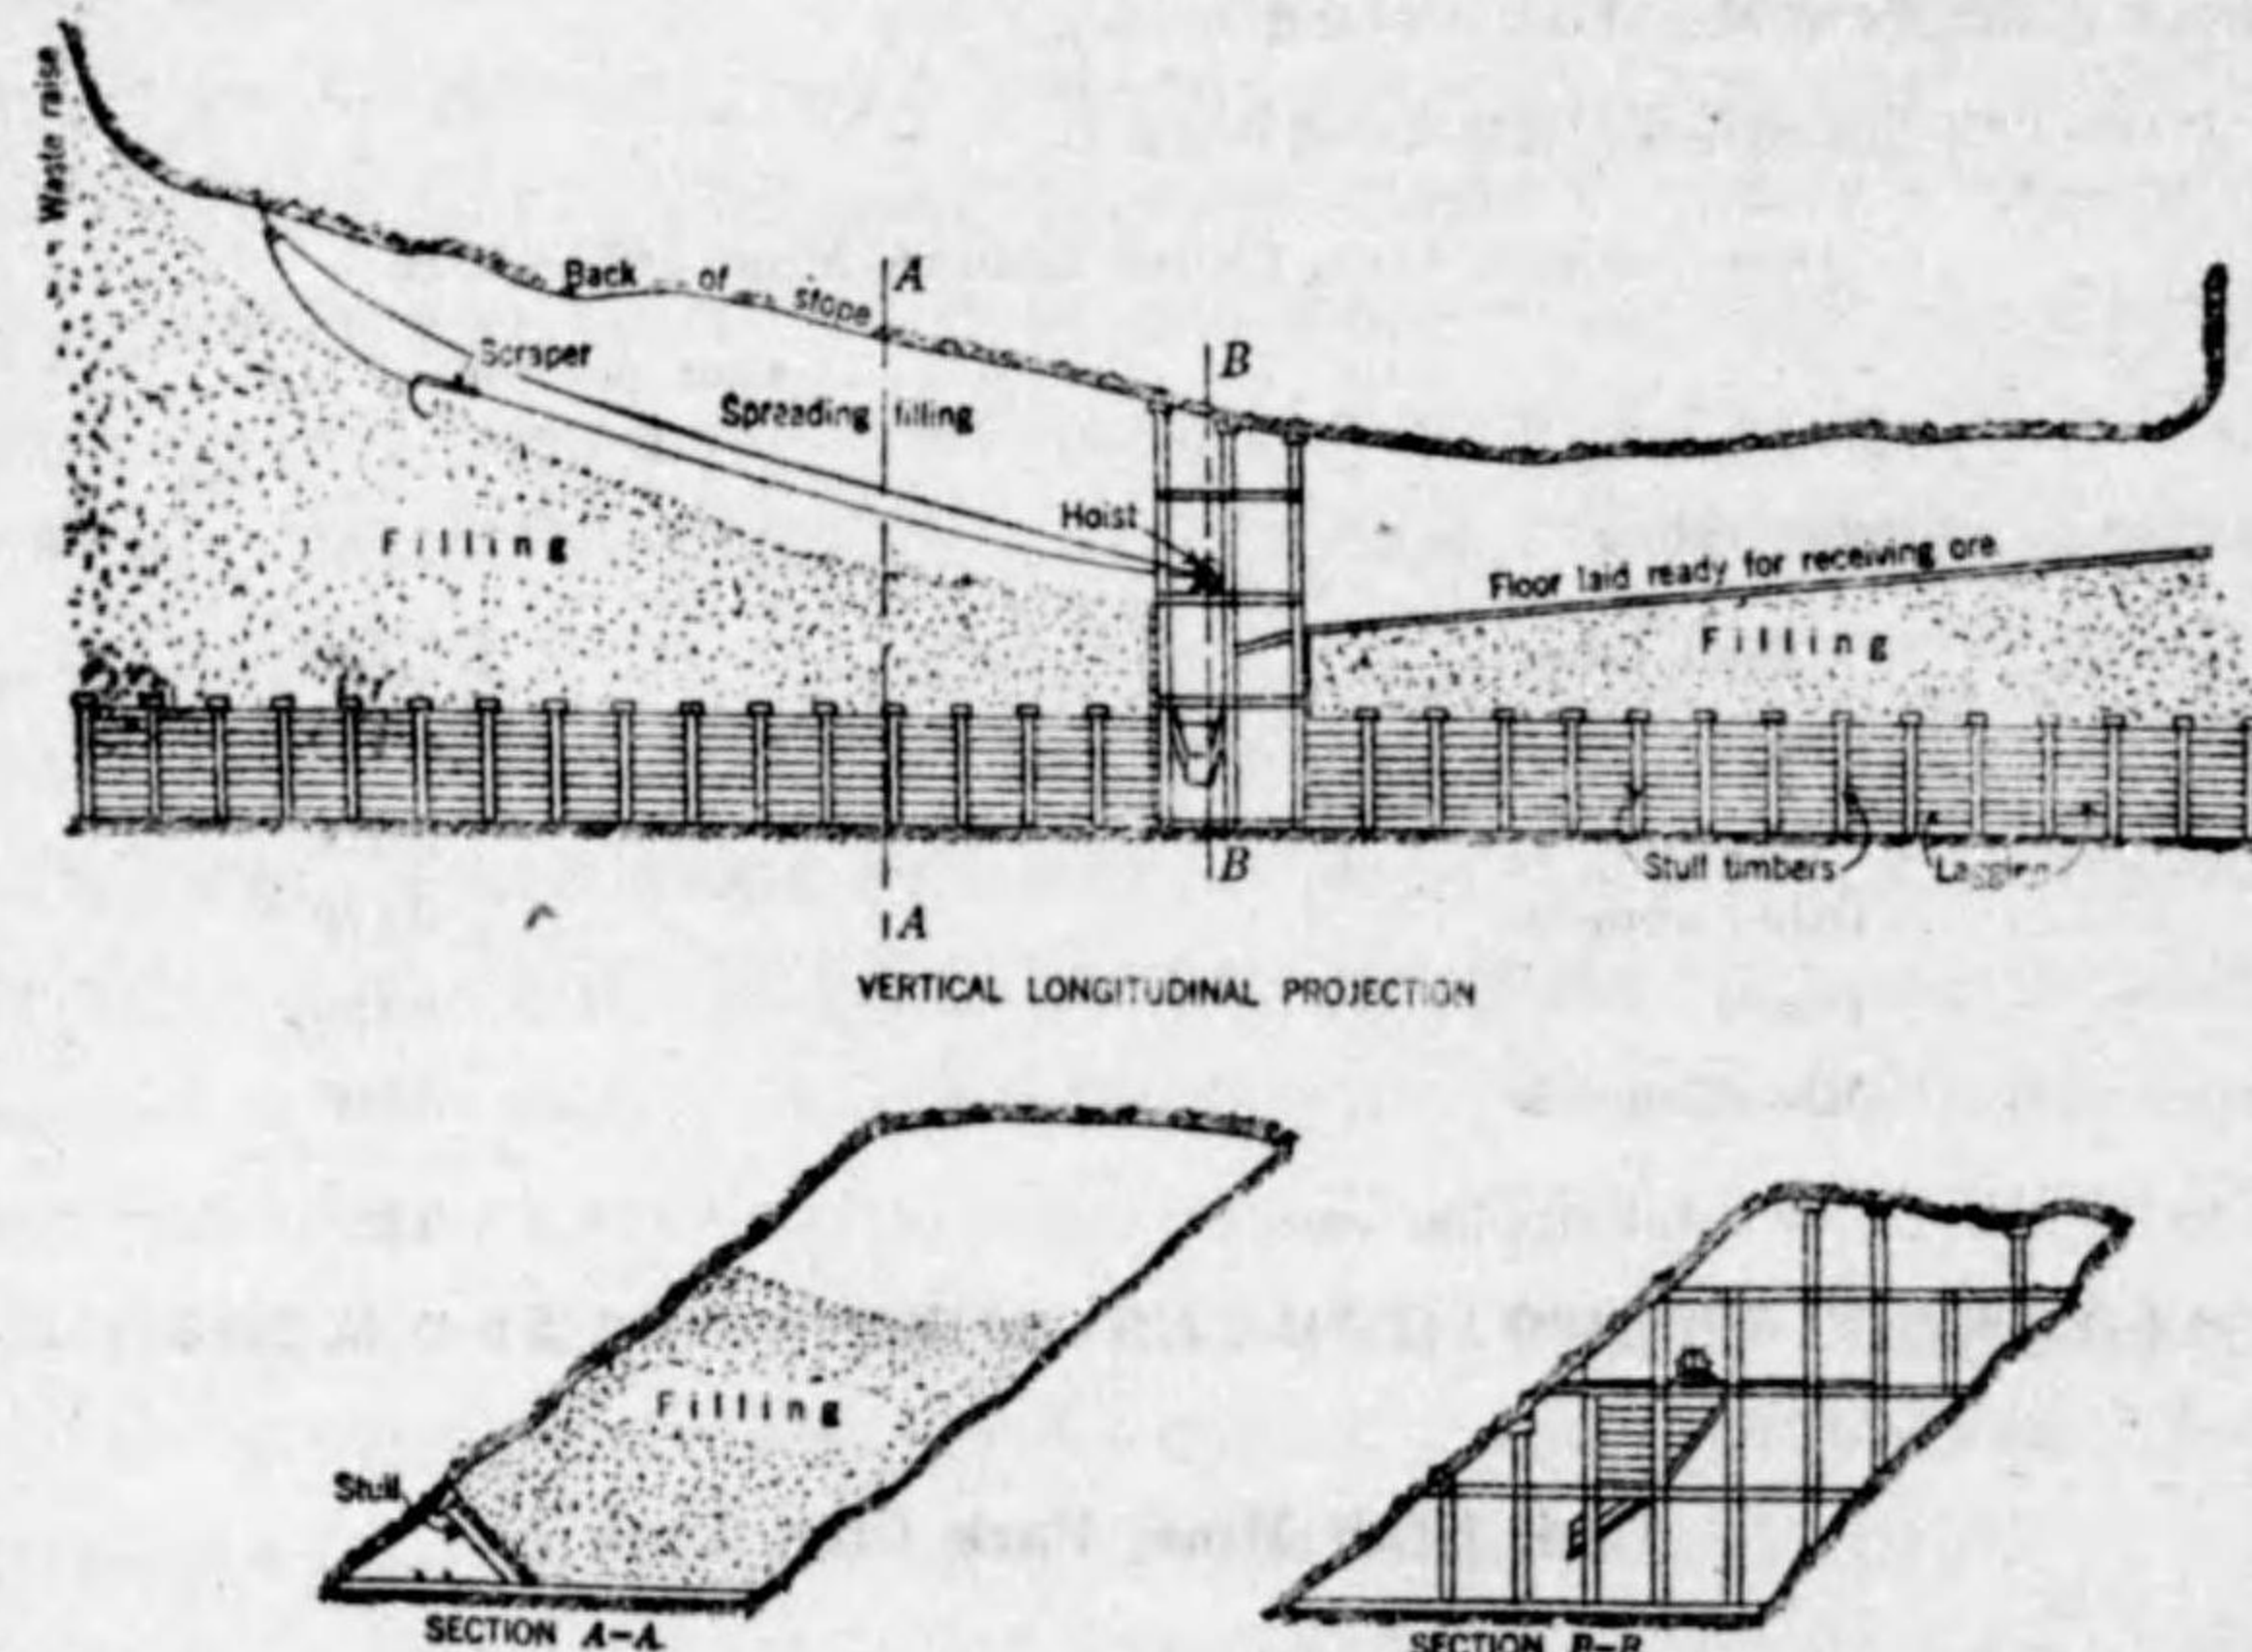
Cut and fill stoping on stull timbers, Park Utah Mine, Utah.
